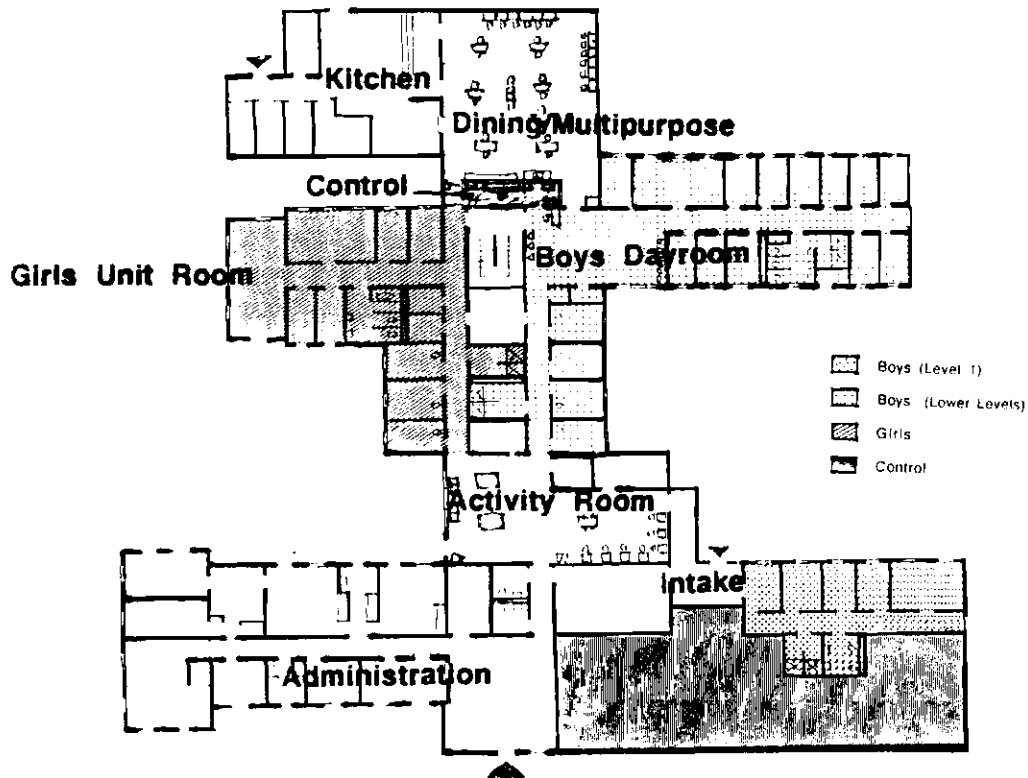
The MAR Center Plan Showing a Pavilion-like Configuration
